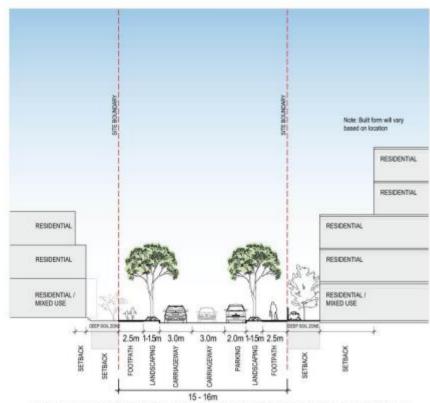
Collector Road (Gilham Street and Carramarr Road)
